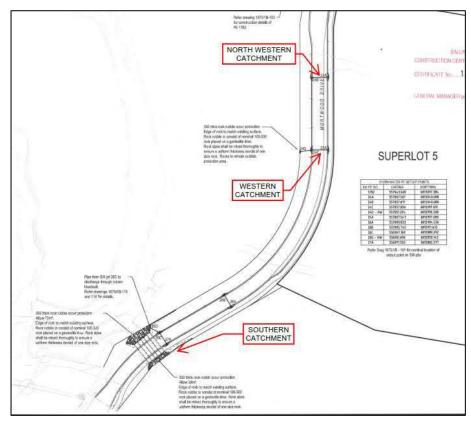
Existing Culverts under Montwood Drive (Source: Geolink Plan 1675/1B 079)
